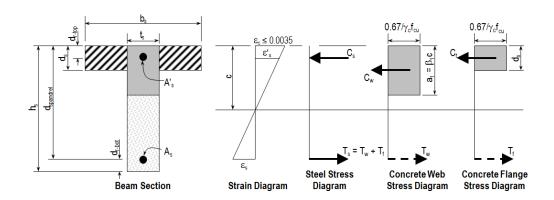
Design of a Wall Spandrel with a T-Beam Section, Positive Moment
